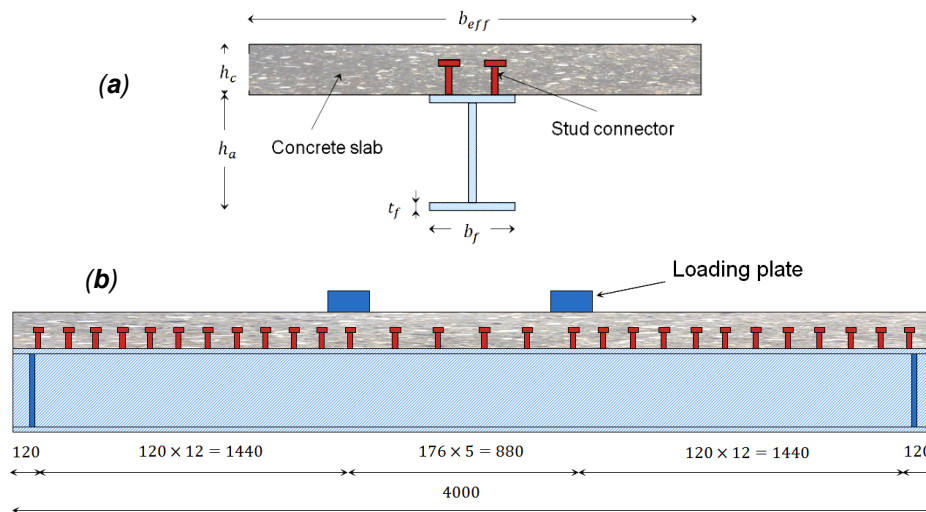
Cross-sectional dimensions of composite beams: (a) cross-section; (b) longitudinal section
